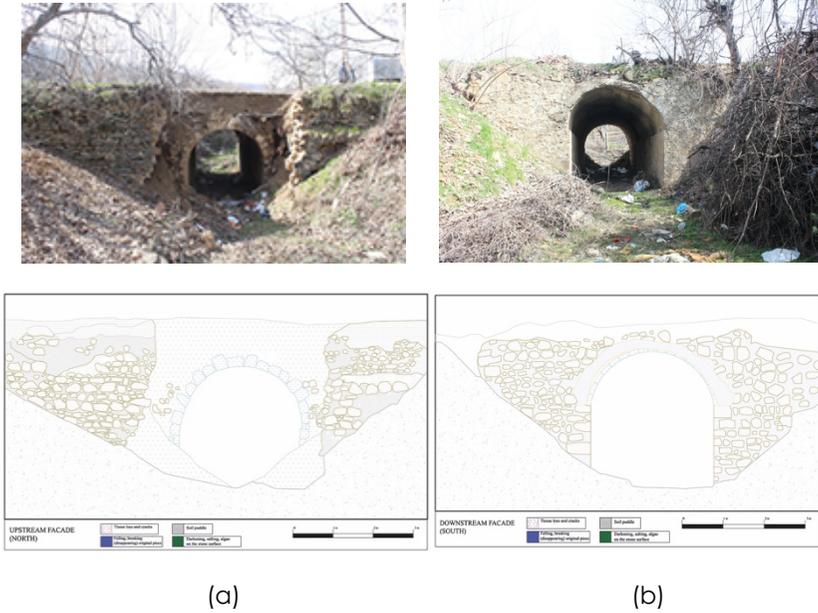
Deteriorations on the upstream (a) and downstream (b) facades of Elazığ-Baskil Yalındamlar II Bridge (Authors archive, 2023)
